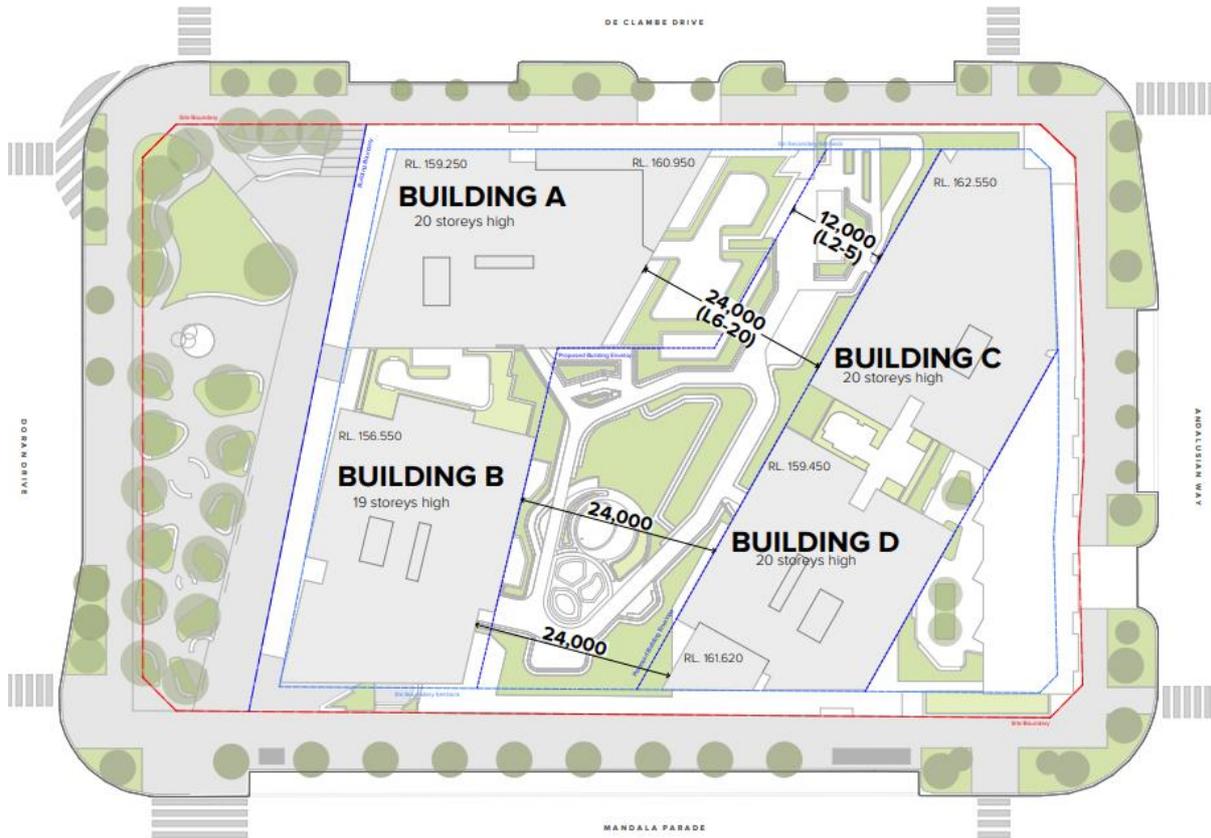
| Residential tower layout and separation plan (Source: RtS)
